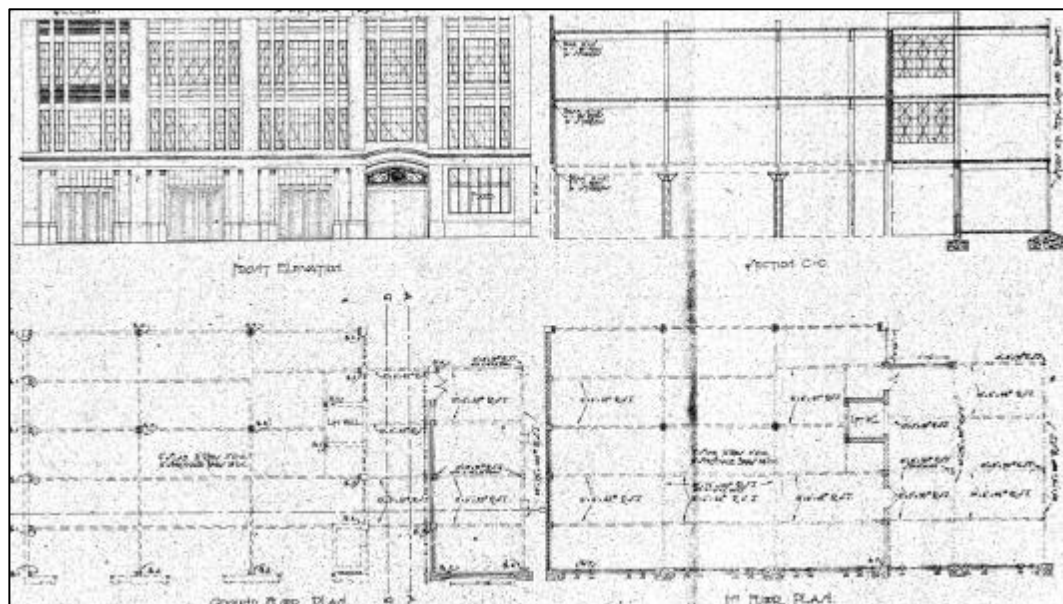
1924 plans show two further storeys at the front of Building No. 12.
